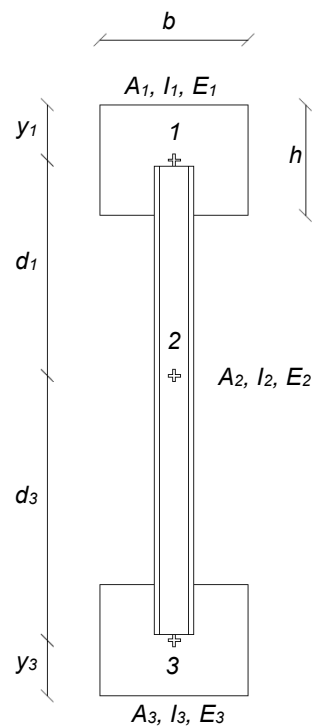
Cross-section and geometric properties of the composite timber-glass beam.
